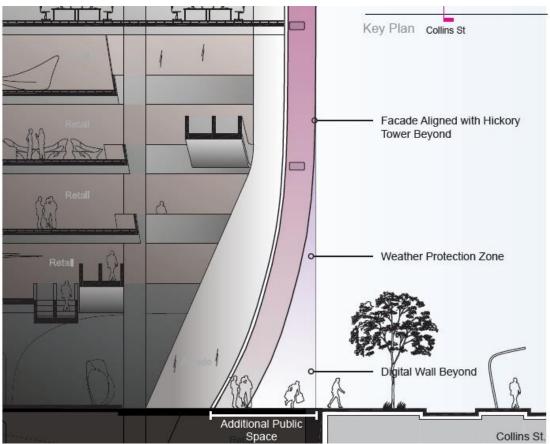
Cross-section detailing the proposed level of weather protection to Collins Street
